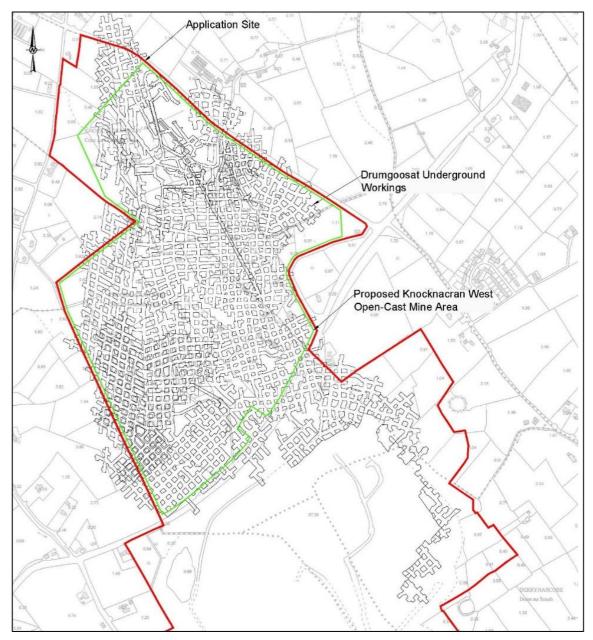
Plan showing extent of the former Drumgoosat Mine underground workings
